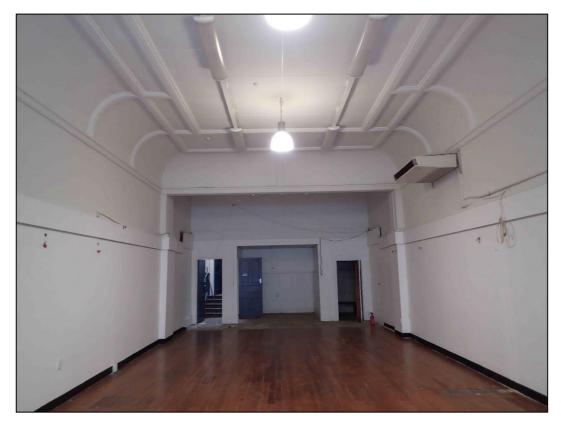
Room 1 of Kingsland's Shop, looking north.
